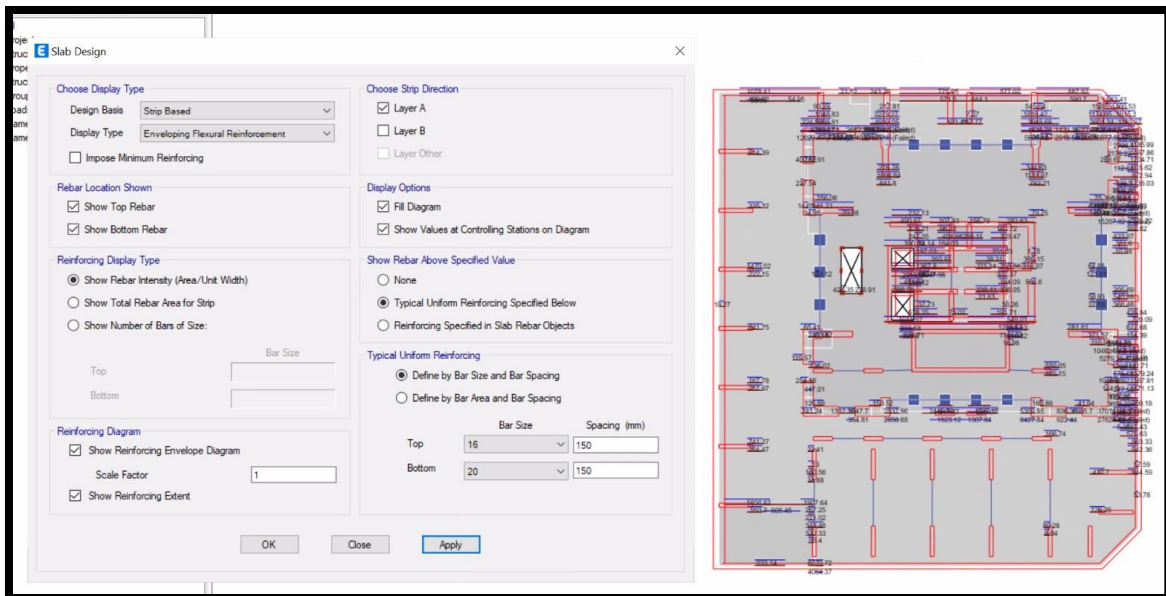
Demonstration for Odd Zones in X-Direction in Ground Floor
